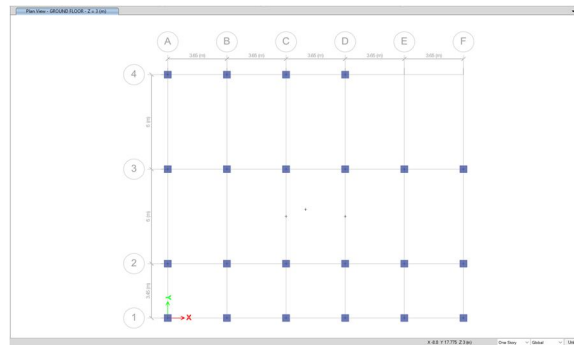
Plan View of the Structure at Ground Floor Level, Z = 3 m (G+2 Structure)
